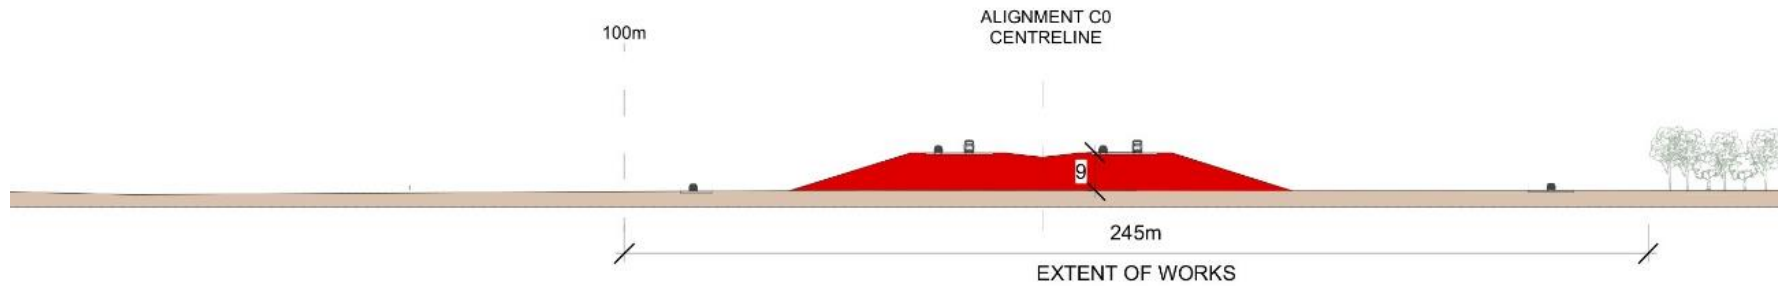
Cross Section 2 – Alignment as it crosses Beaufort–Lexton Road.
